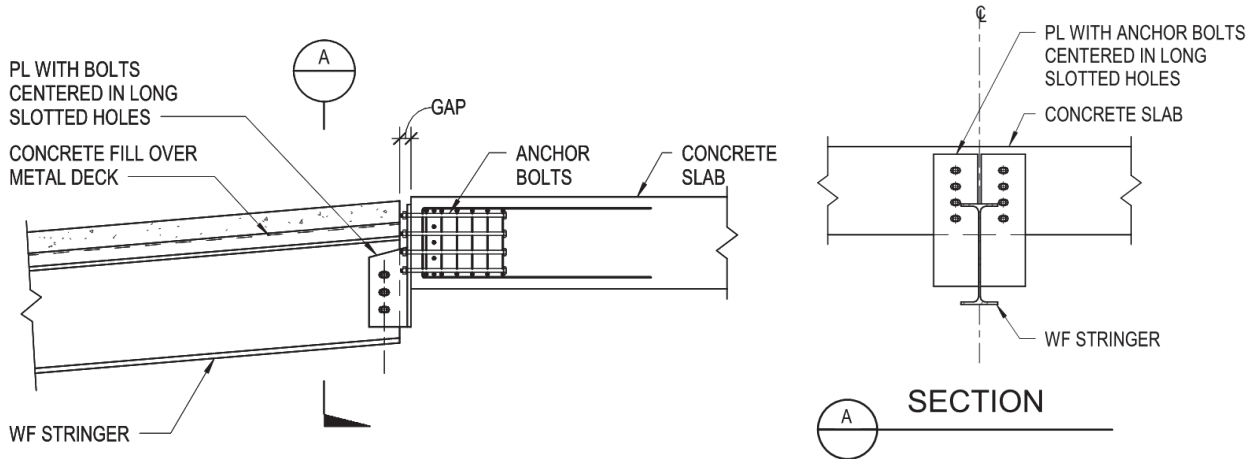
Examples of Slip Connections at Top of Ramp – Longitudinal and Transverse Direction
